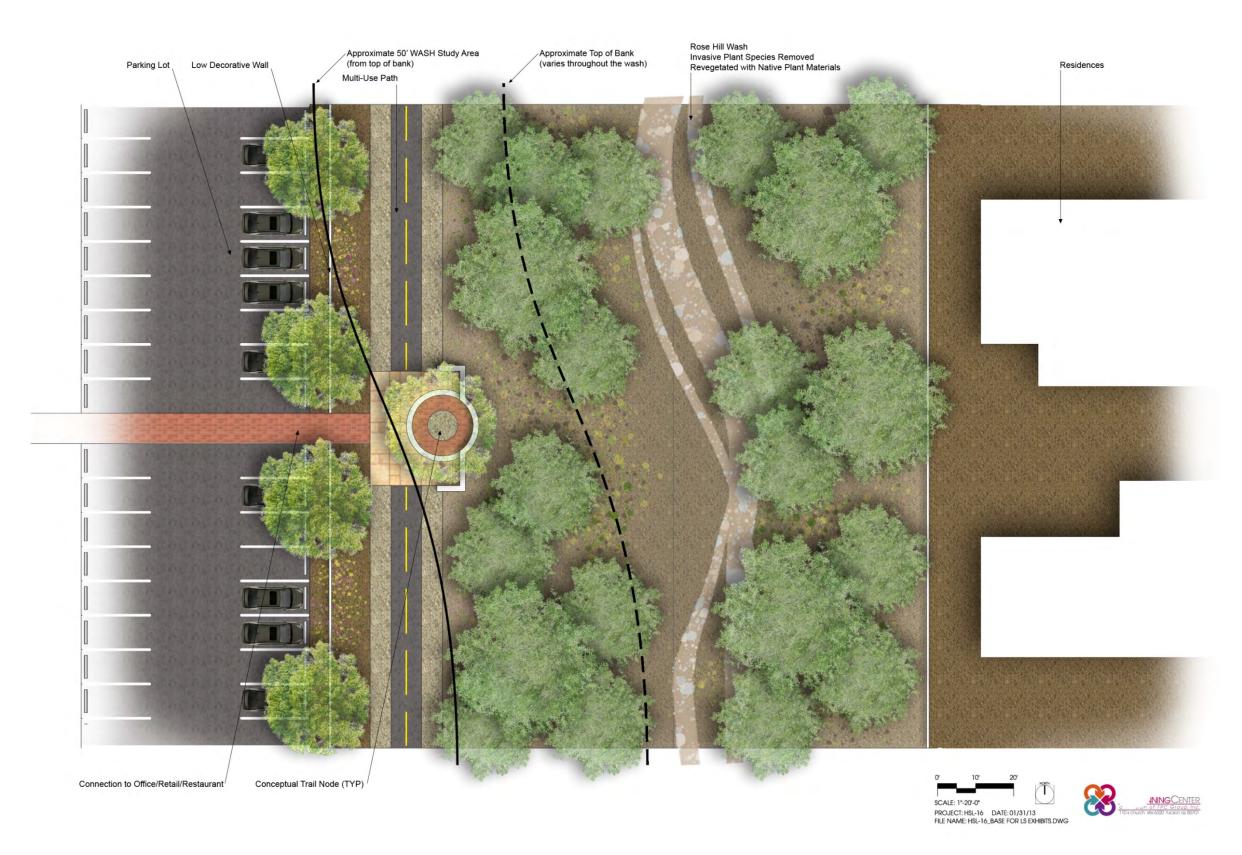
Typical Plan of Wash Mitigation Planting Area and Multi-Use Path
